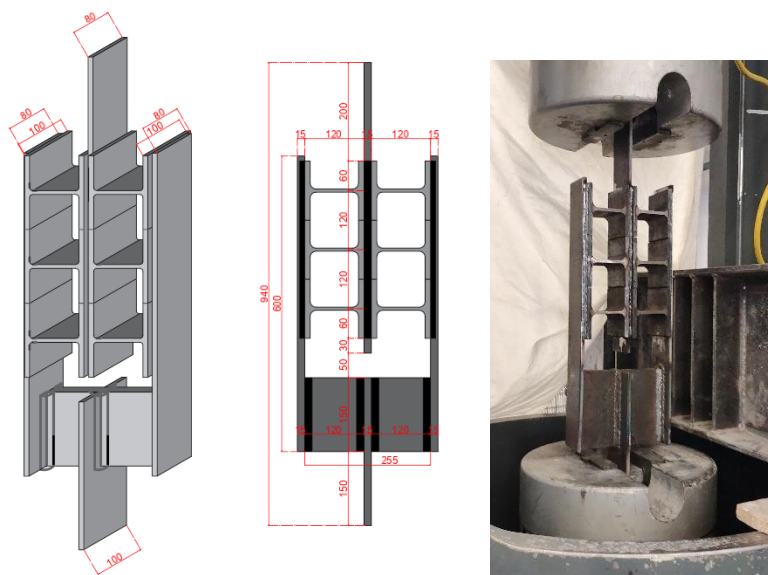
On the left-side: geometric dimensions of the metal samples. On the right-side: view of the same specimen in the test machine.
